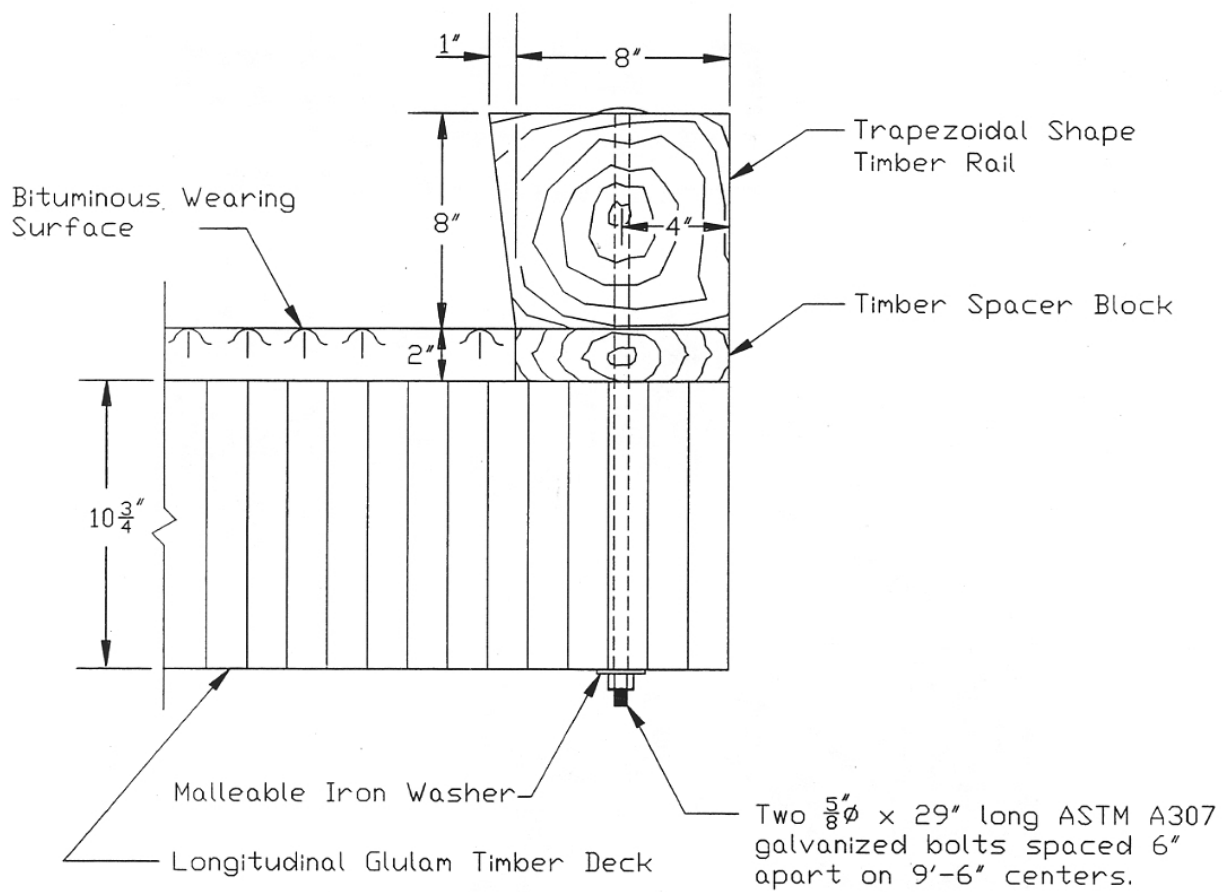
Schematic of 8-in. High, 8-in. x 9-in. Trapezoidal Shape, Test LVCT-1a
